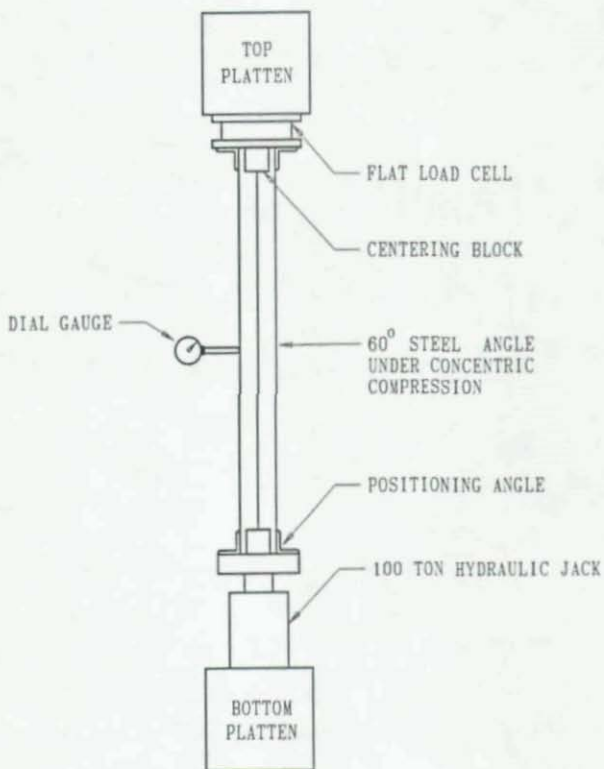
TEST SET-UP FOR SCHIFFLERIZED AND COLD-FORMED 60° STEEL ANGLES
